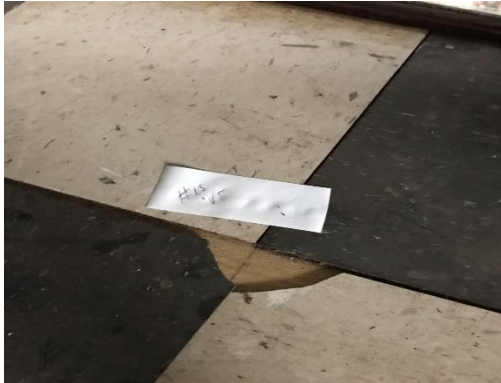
&b: Vinyl Floor Tile (White and Black) Store Front Glass Cabinet - (ND)
